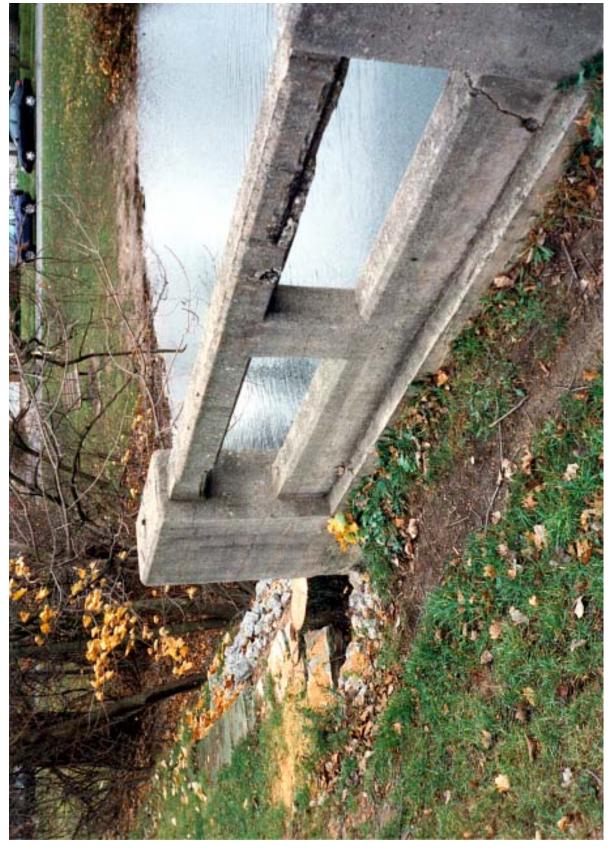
Damaged railing and riprap on the bank of the Columbia Avenue vehicular bridge. LANDSCAPES LA•Planning•HP.
